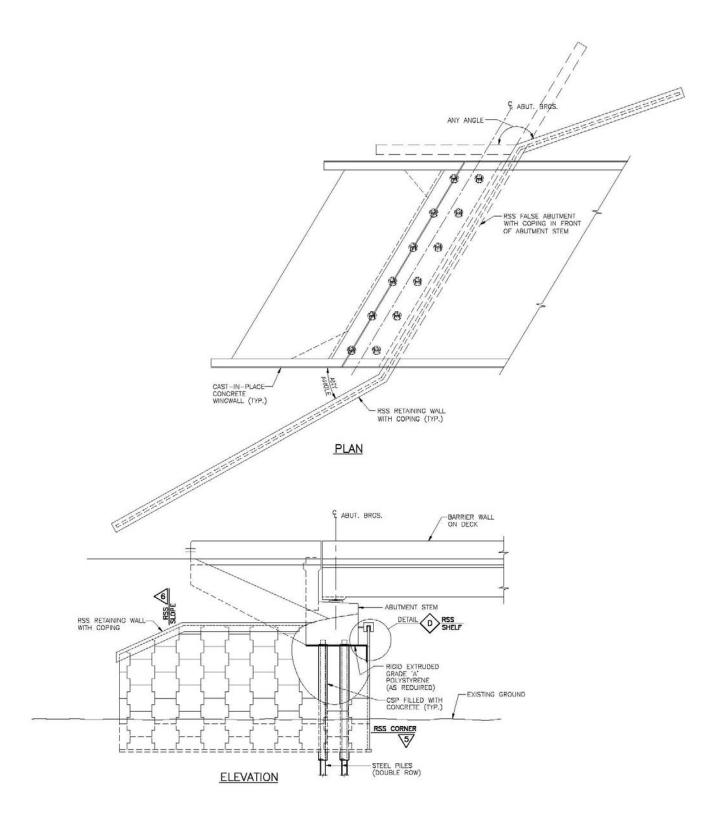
Rigid Piled Bridge with RSS False Abutment and Flared RSS Walls. For Section 5 and 6, see Figures 5.15 and 5.16 respectively. For Detail D, see Figure 5.9.
